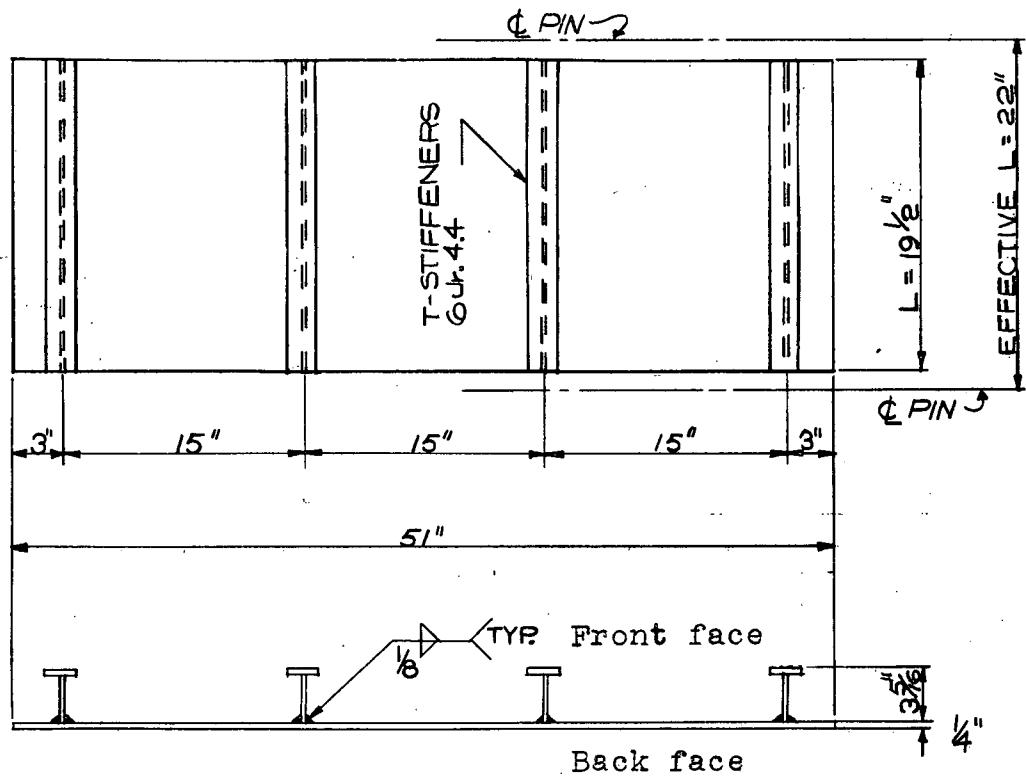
TEST SPECIMEN DIMENSIONS (T-10S)
